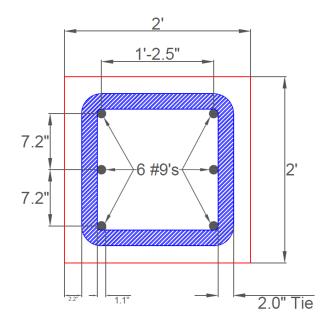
Designed Reinforcement in 2 ft x 2 ft Concrete Column
